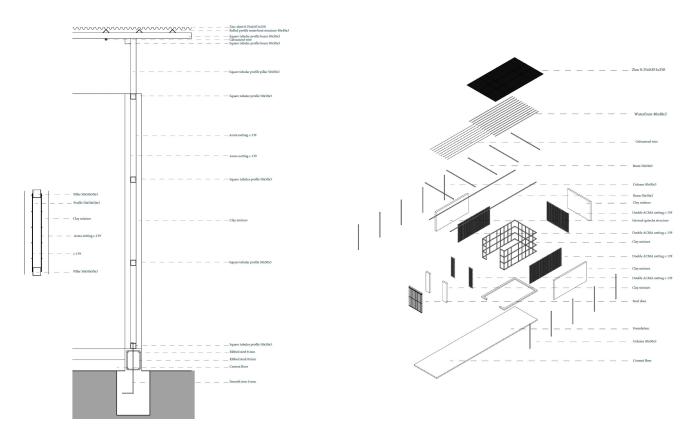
A wall section of the "Techno-Quincha", and an exploded axonometric diagram illustrating the parts and assembly of the construction. The Students
